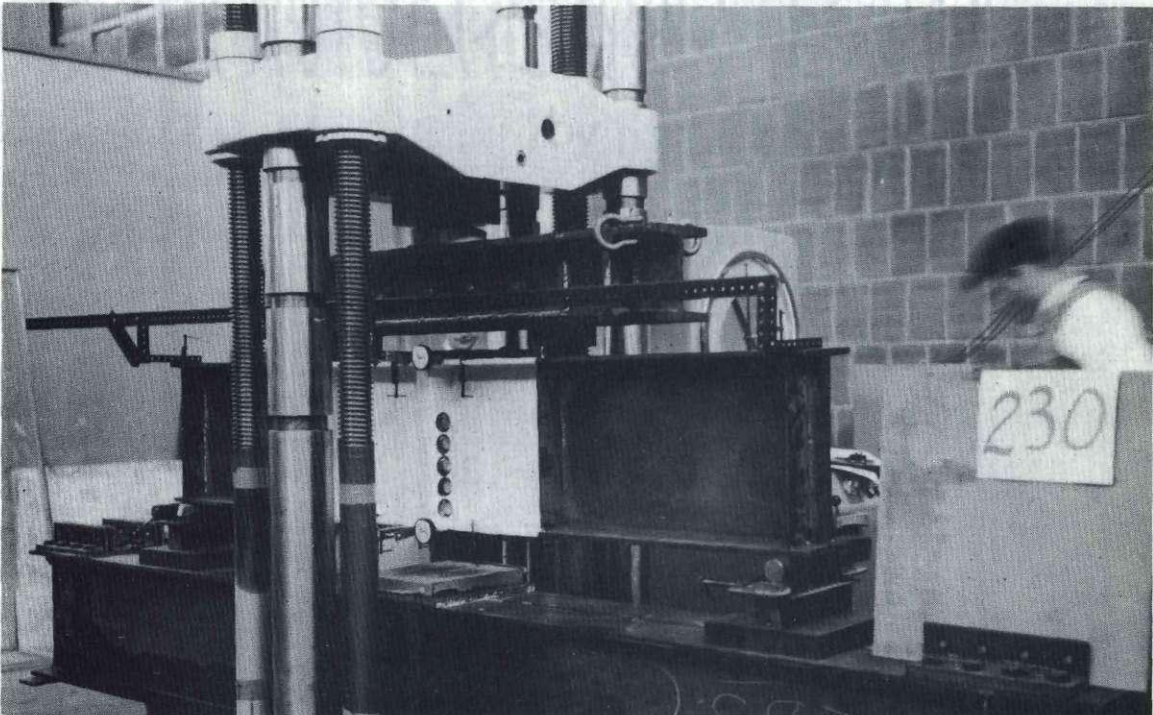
Test 18,50-8-10,7 Eight Kips Above Yield Load of Connection Plate
